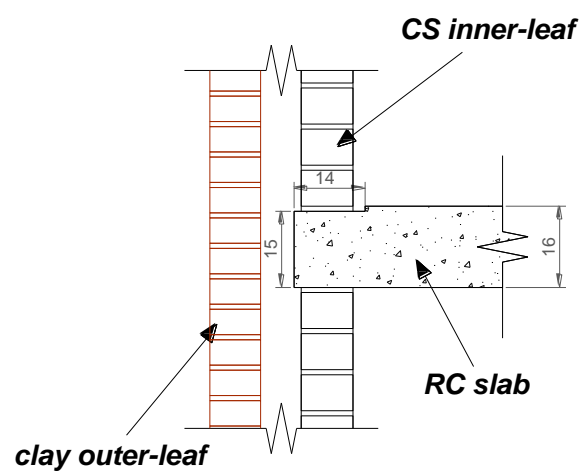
Reinforced concrete slab-to-wall connection detail. Units of cm.
